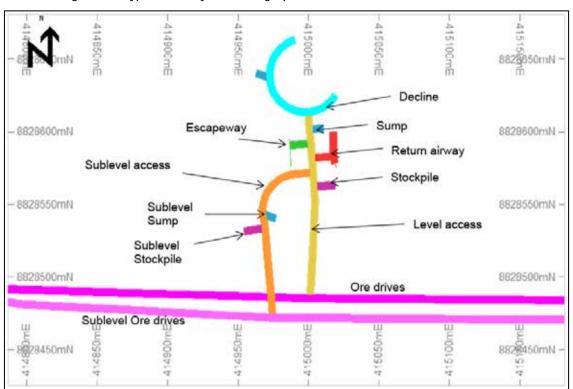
Typical level layout showing a plan view of the 7.5m access to the sublevel
